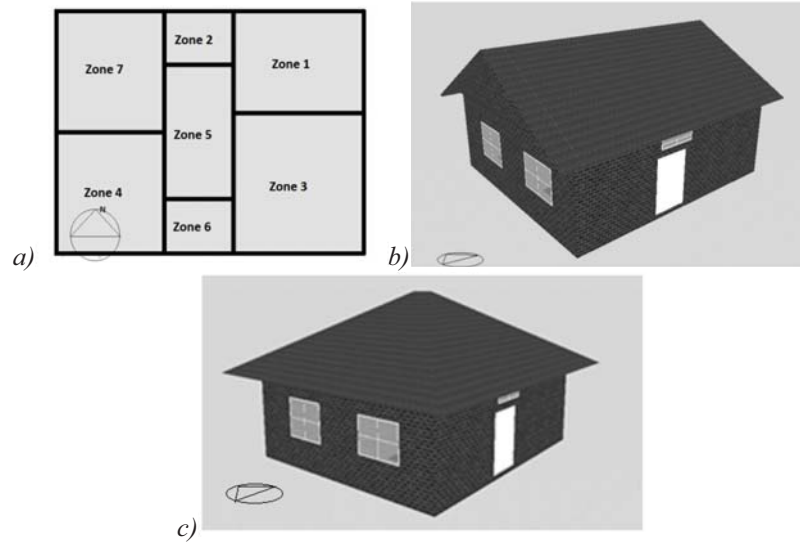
Geometric characteristics of the analyzed houses: a) floor plan, b) gable-roof house, c) hip-roof house
